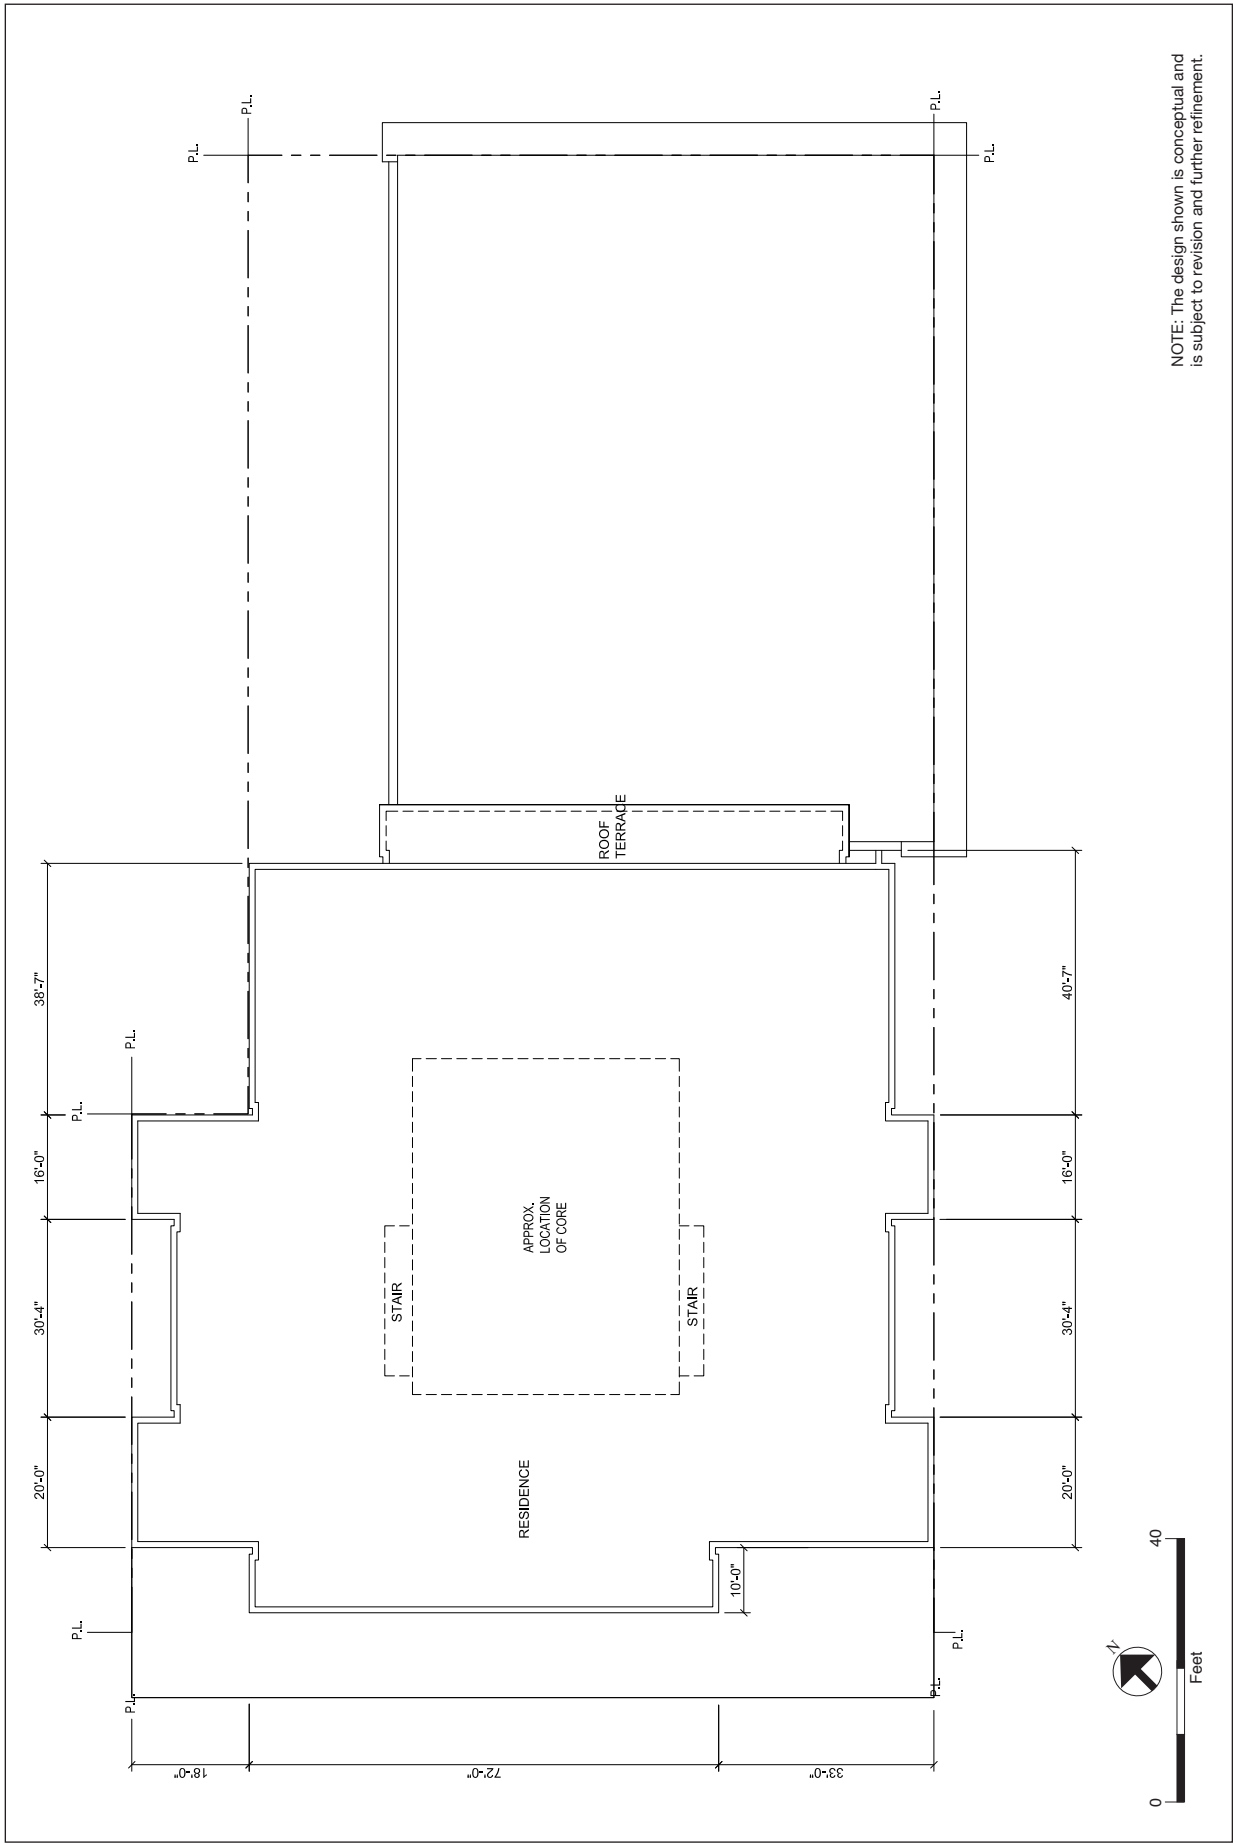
CONCEPTUAL FLOOR FOR FLOORS 13 AND 14 - TOWER, CONCEPTUAL ROOF - ARONSON BUILDING
